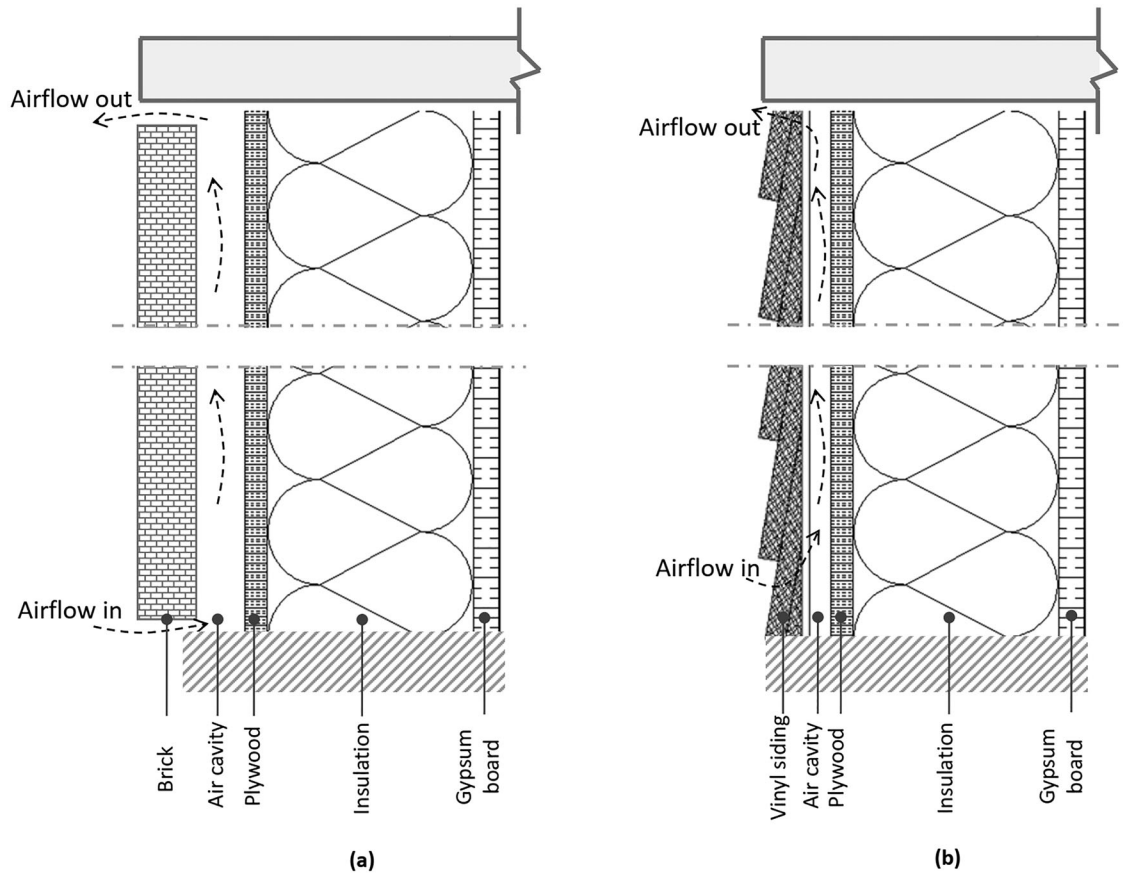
Cross-sections of typical ventilated wall assemblies: (a) brick veneer, (b) vinyl siding.
